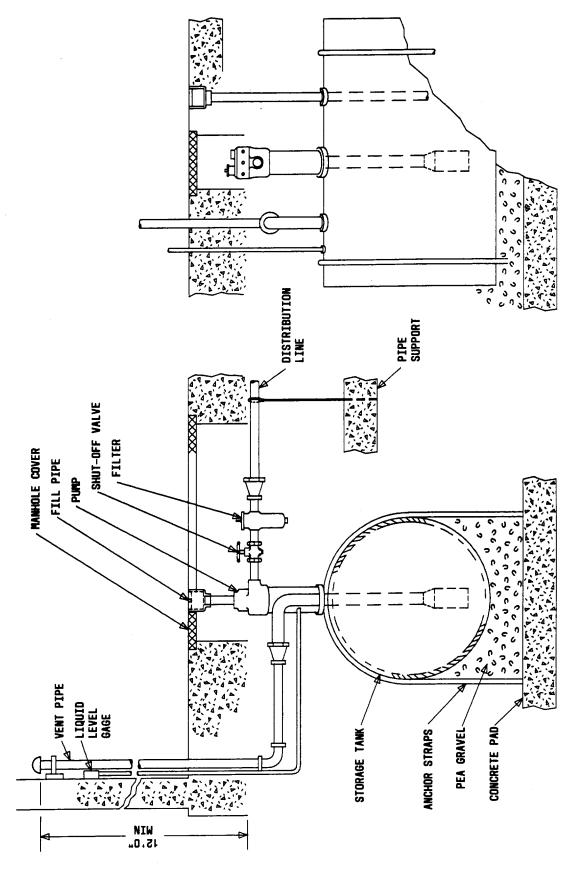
Typical Equipment Layout—Storage Tank Piping
